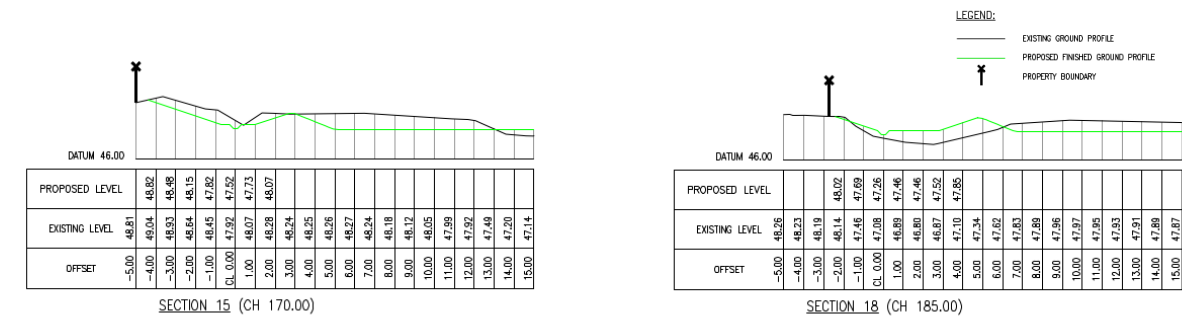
Cross section examples of proposed ground profile (replicated from civil drawings).
